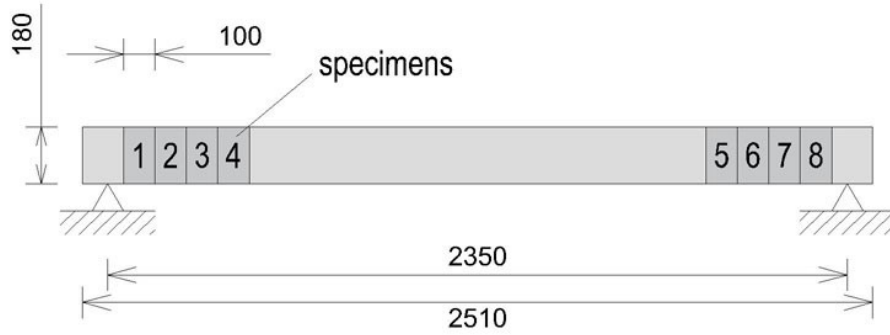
specimens extracted for tensile and compression tests on the fractured-glass-interlayer composite material
